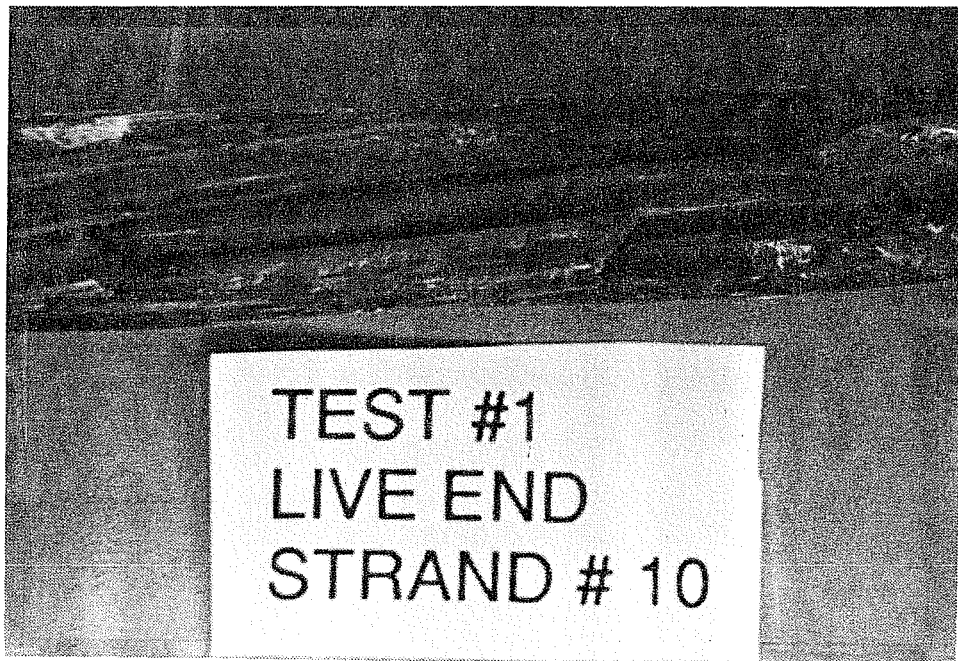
Photograph of a Test #1 wire fracture with a fretting fatigue fracture surface.
